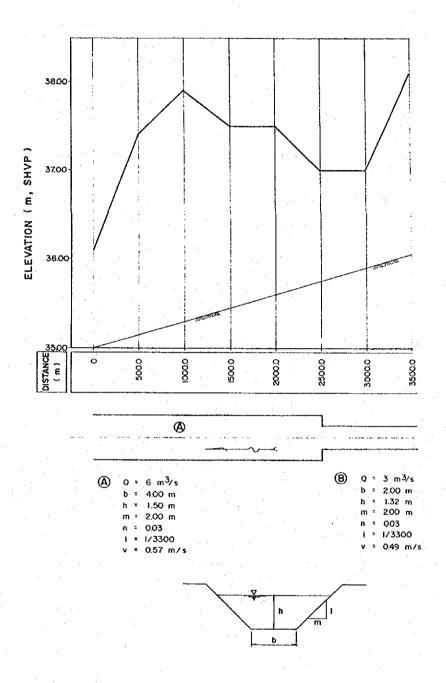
LONGITUDINAL PROFILE AND STANDARD CROSS - SECTION OF DRAINAGE CANAL IN UPSTREAM REACH OF RIGHT WIDAS RETARDING BASIN (3/3)
